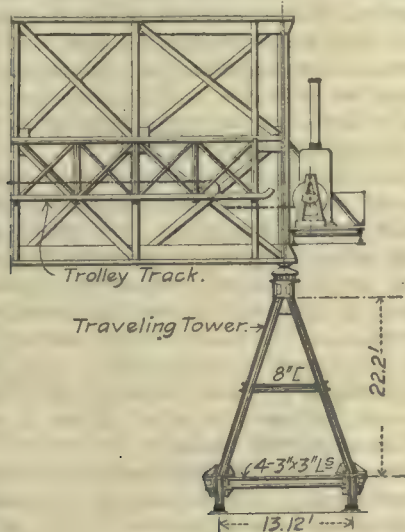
MOVABLE PIERS SUPPORTING ERECTING TRUSSES.
